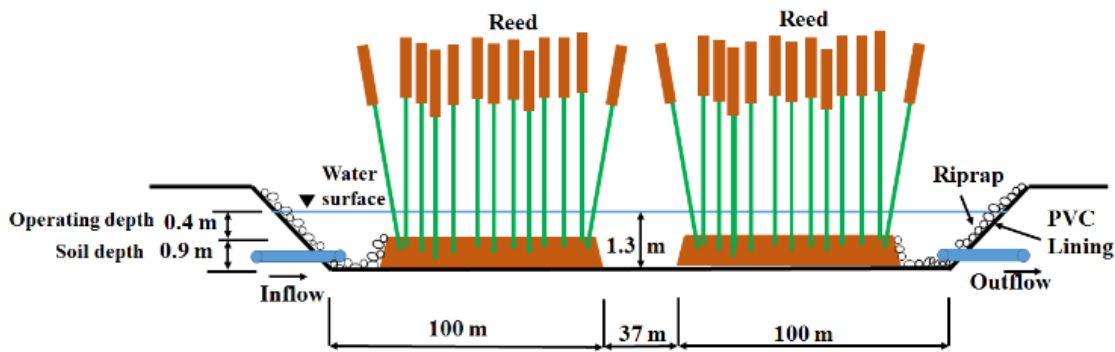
Cross-section elevation of the proposed constructed wetland.
